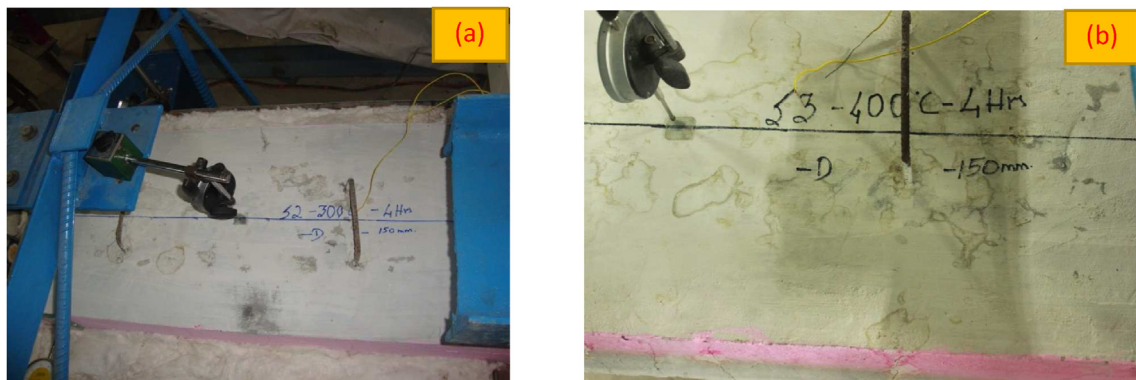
Oozing of water from tested specimens (a) water oozed out (b) water evaporated at tested specimens.
